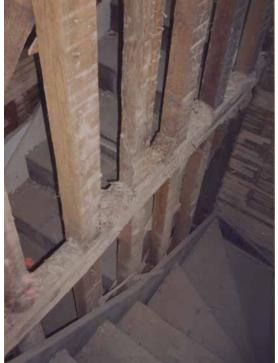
The south stair (C105), looking east (upper left) and in the space below the stair (above). *JGWA*, 2024.
